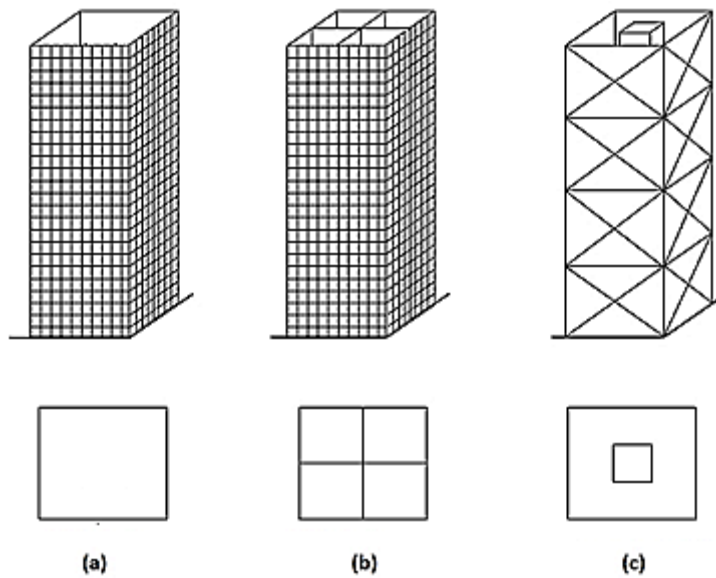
Tube structural systems of type (a) framed tube; (b) bundled tube; (c) trussed tube.
